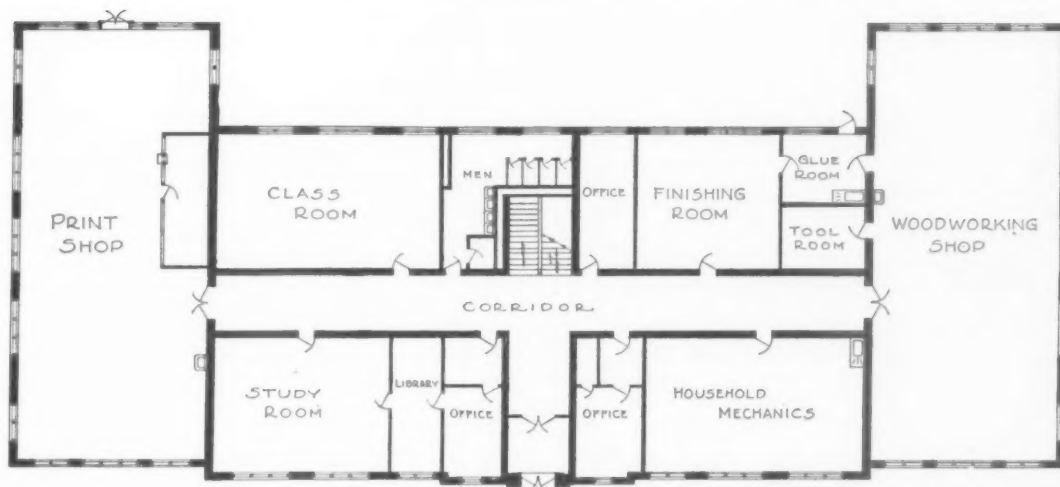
THE FIRST-FLOOR PLAN OF THE INDUSTRIAL ARTS BUILDING
